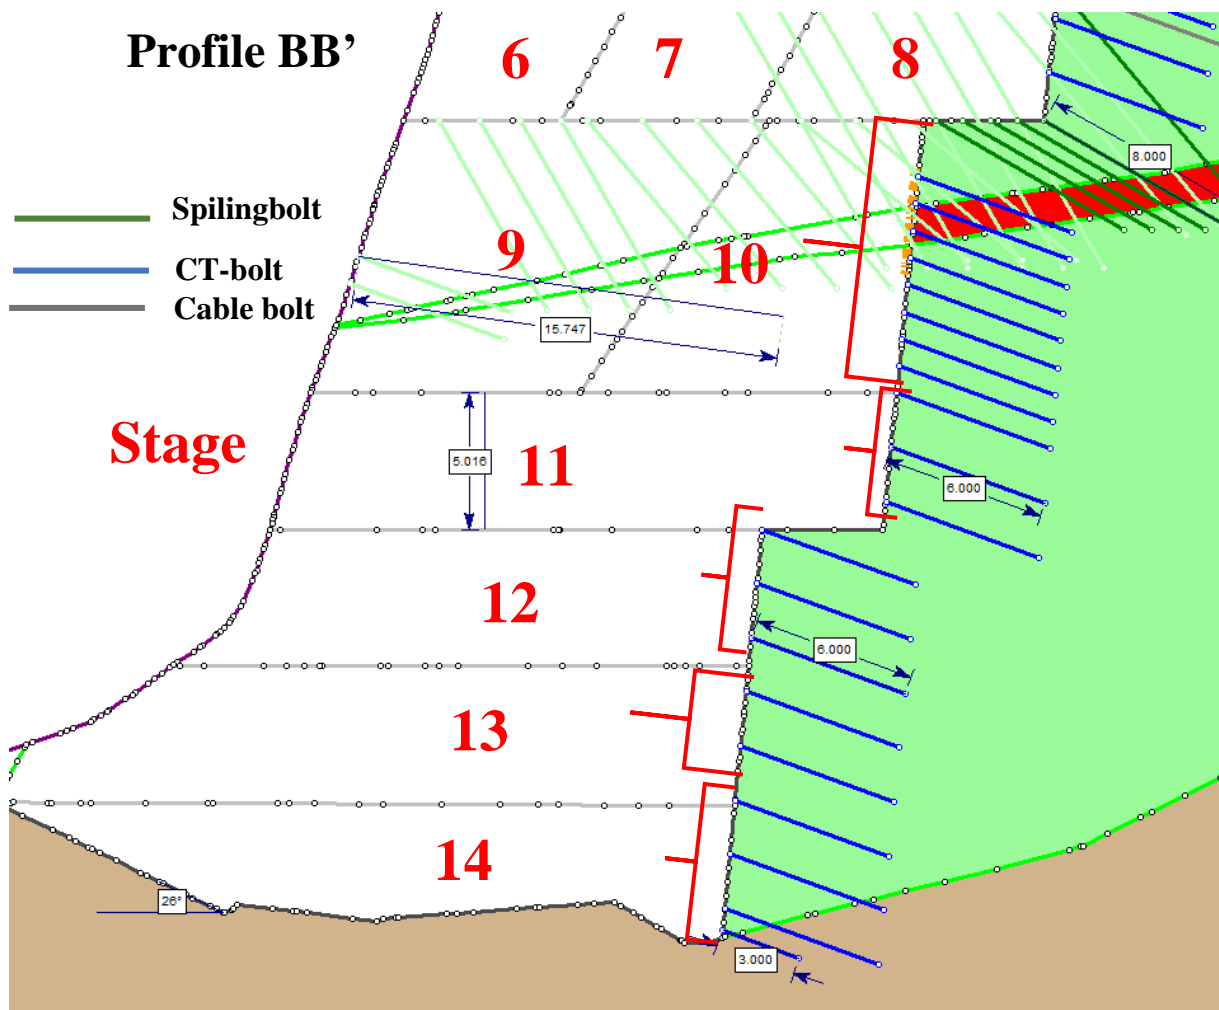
Excavation stages and corresponding installation stages for the stability measures at profile BB'. Spiling bolts longer than 8 m are in reality Ischebeck self-drilling rock anchors [2/2].
